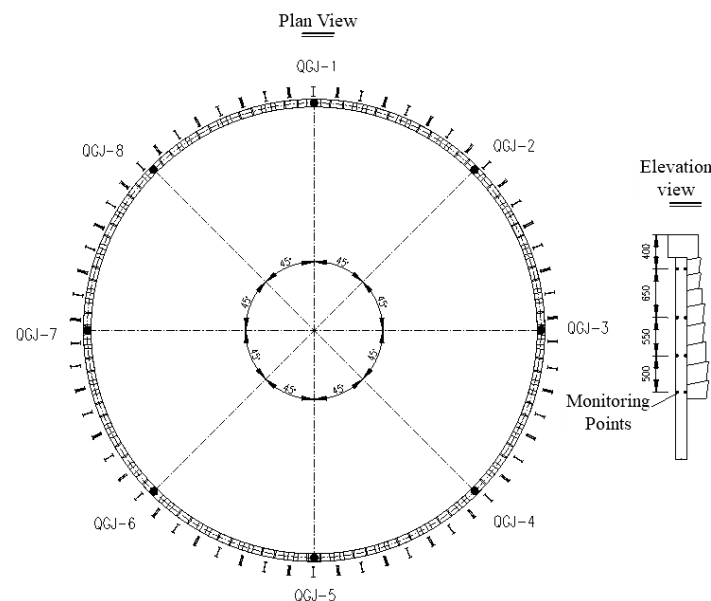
Layout of steel stress monitoring points on the diaphragm walls (cm).
